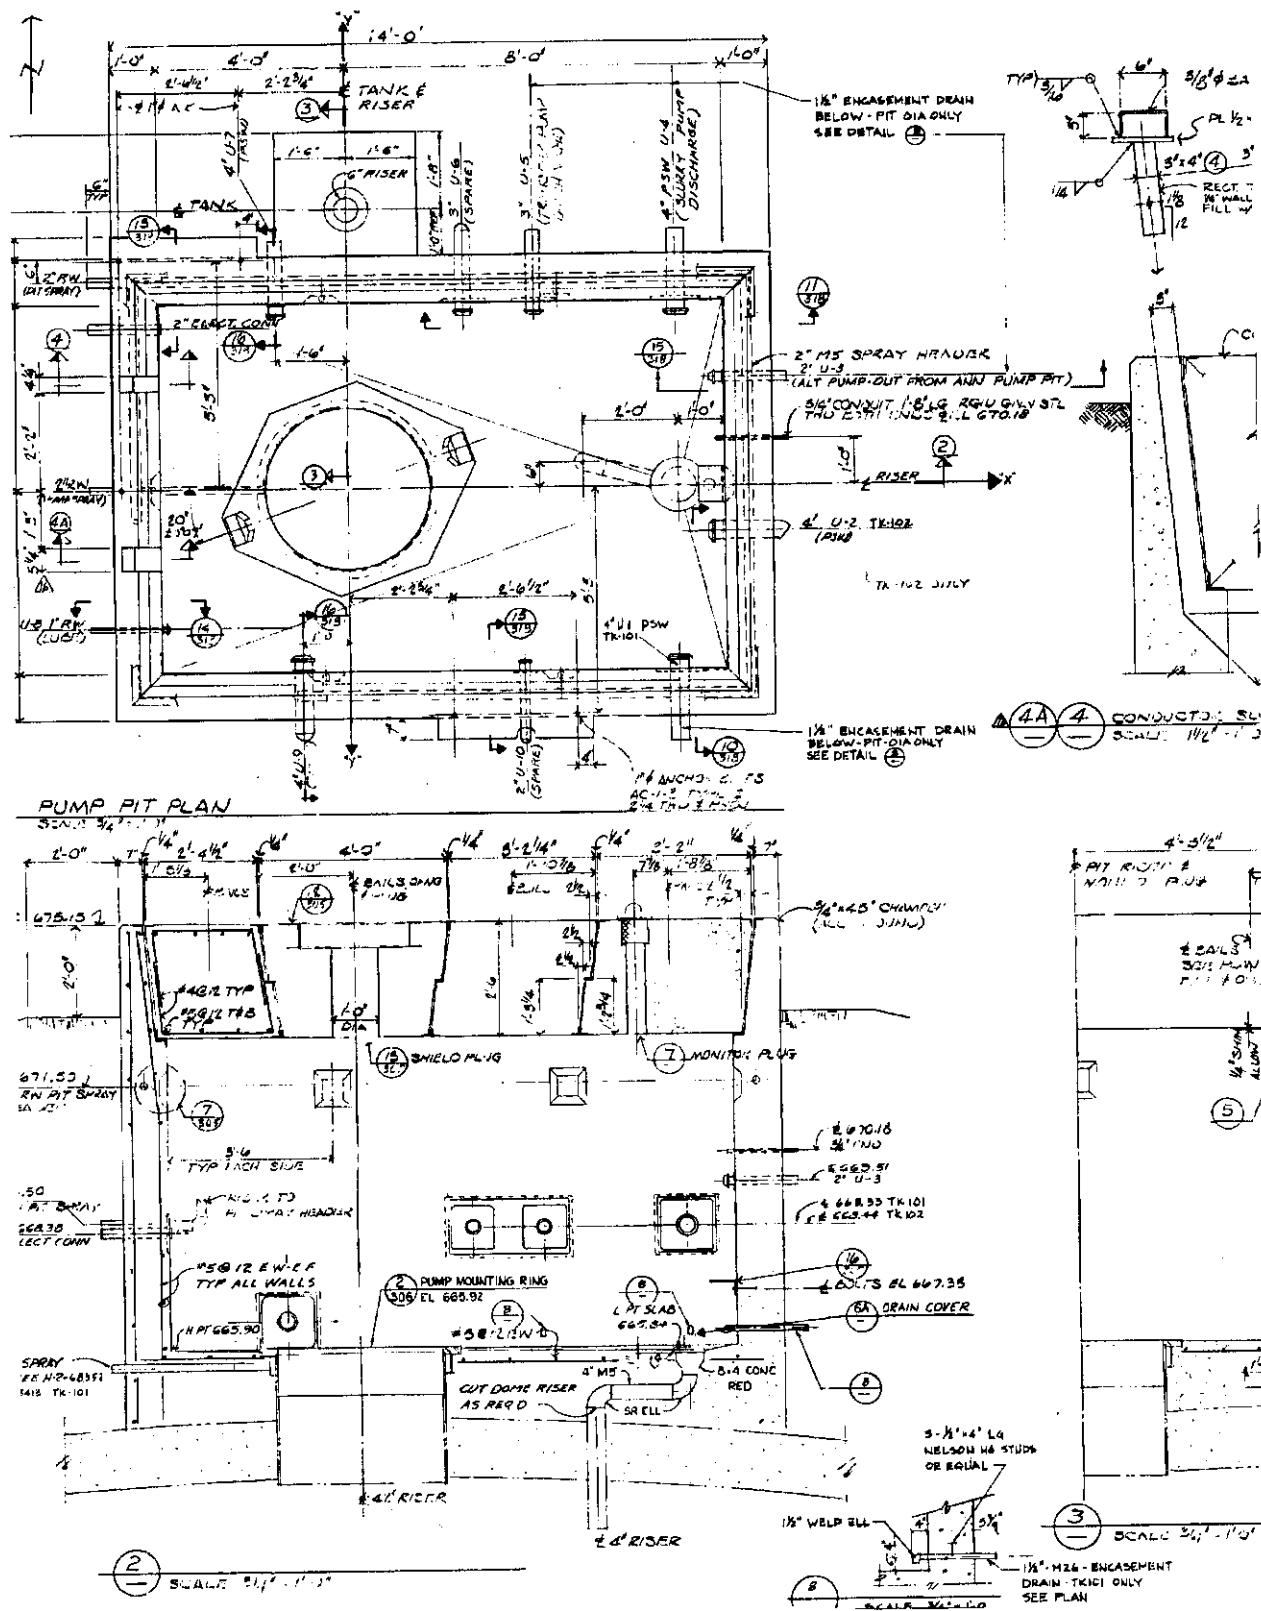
Structural Concrete Pump Pit Plans - Part 2 of 2
